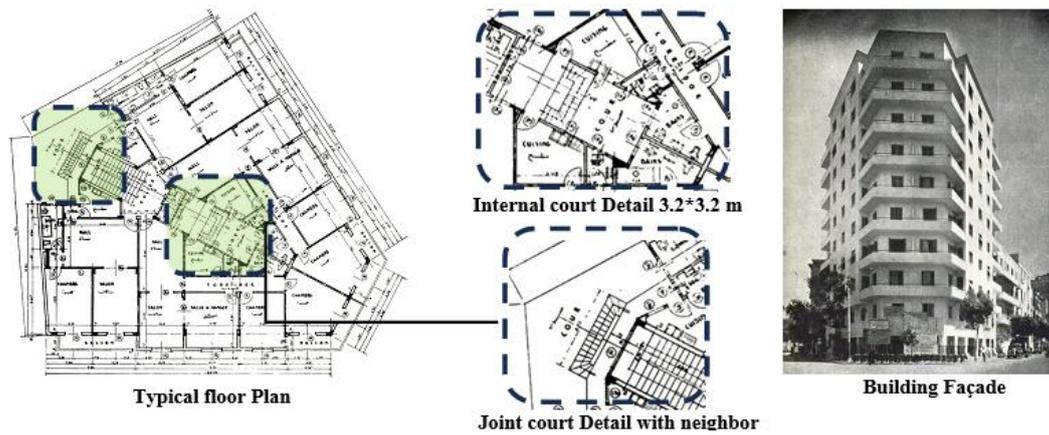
Ahmed Abdelkhalek Apartment building by sherif Noaman [17]
